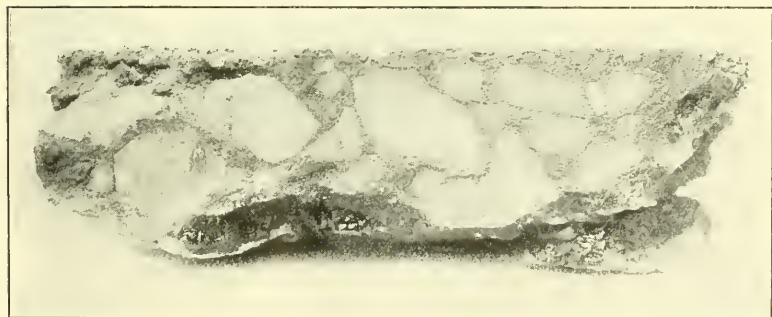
SEC. 12A.—BITUMINOUS PAVEMENT, BUILT BY PENETRATION METHOD.
